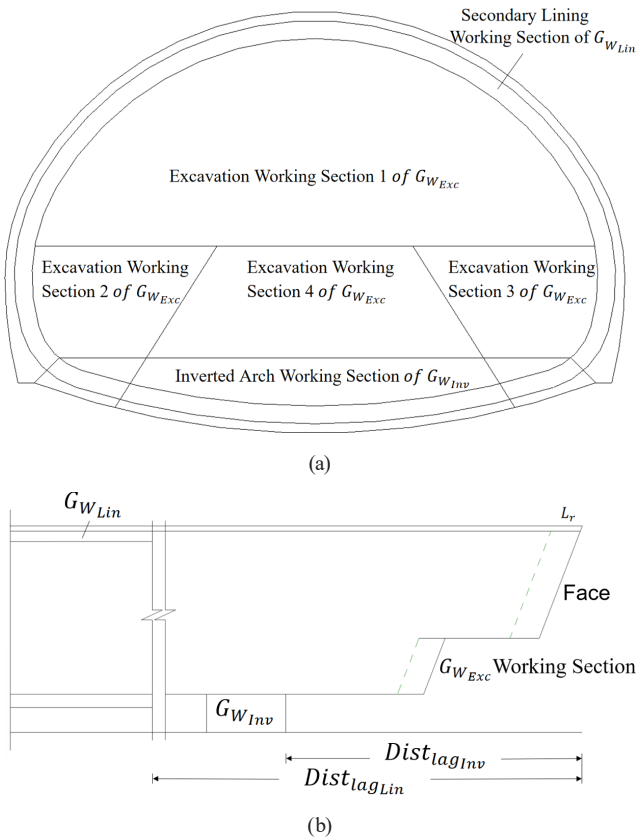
Schematic diagrams of tunnel: (a) cross-section and (b) longitudinal section
